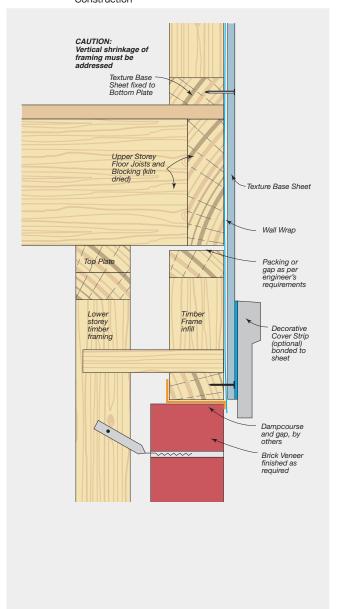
Typical Horizontal Junction with Brick Veneer Construction
